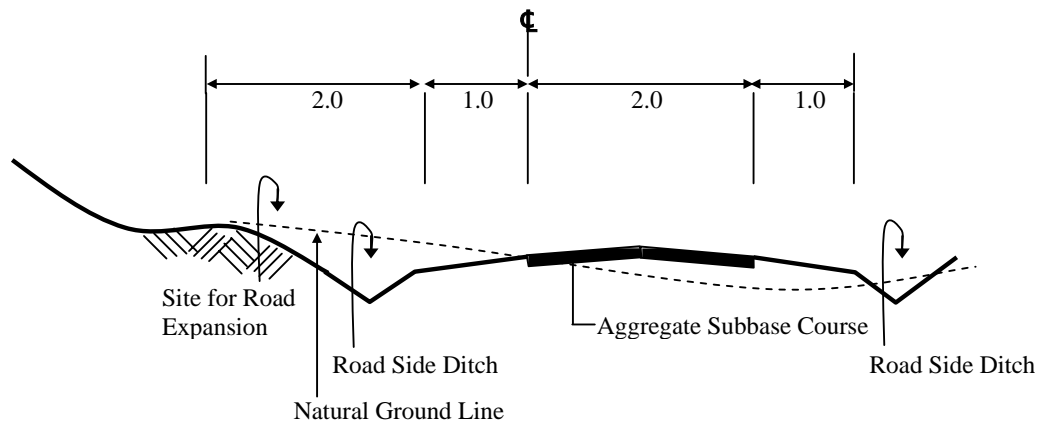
Typical Cross-Section of One Lane Concrete Road
